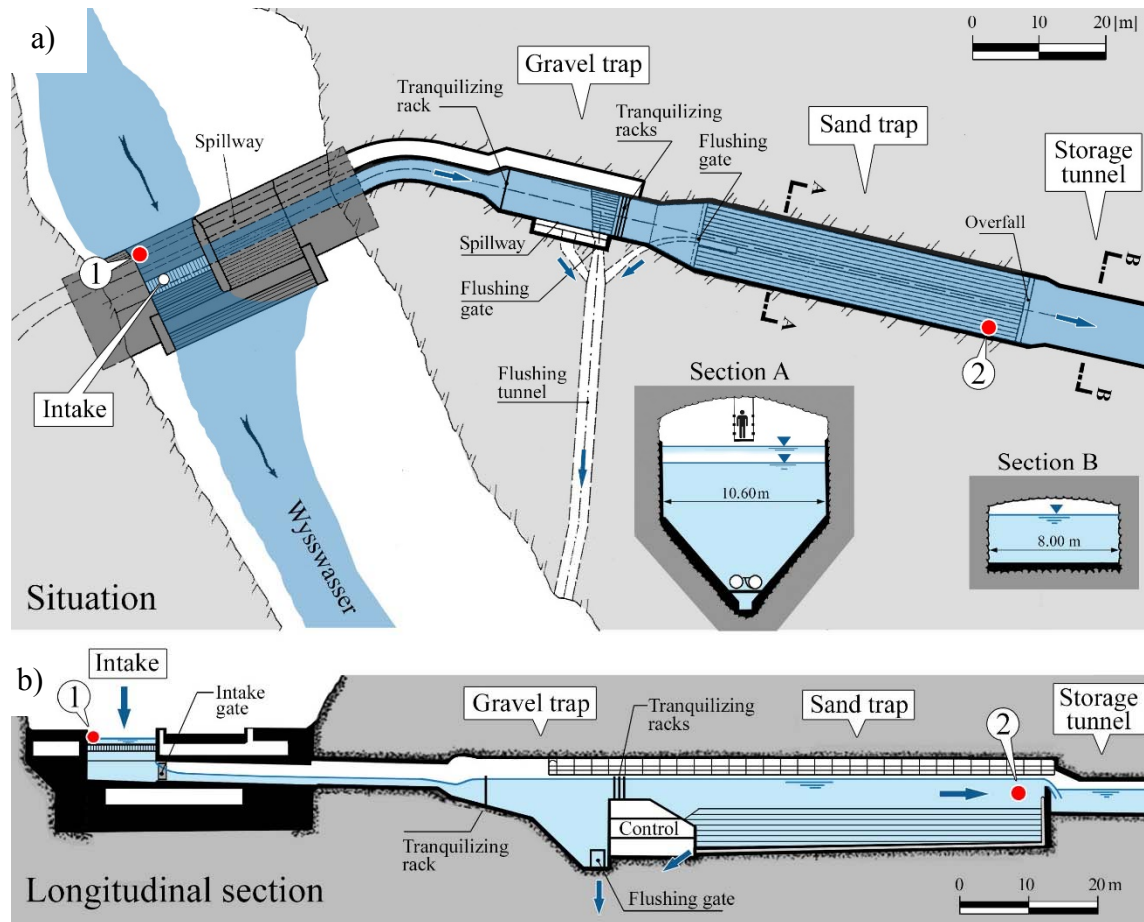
Layout of the headworks of the HPP Fieschertal in a) plan view and b) longitudinal section (based on construction drawings, GWK 1972); (1) and (2) refer to installed turbidimeters.
